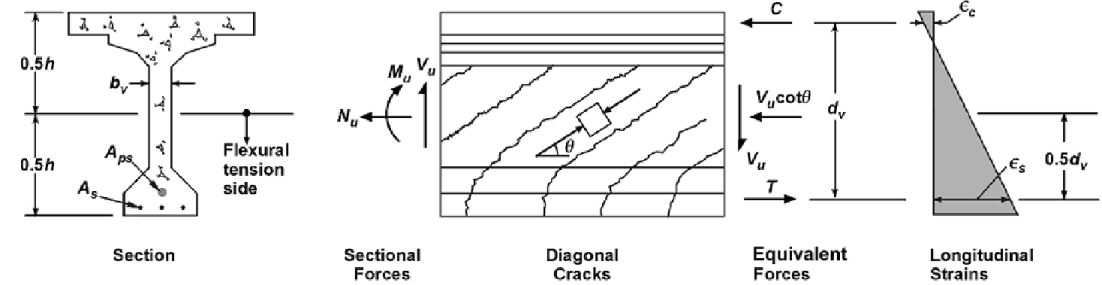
Illustration of Shear Parameters for Section Containing at Least the Minimum Amount of Transverse Reinforcement, $V_p = 0$
